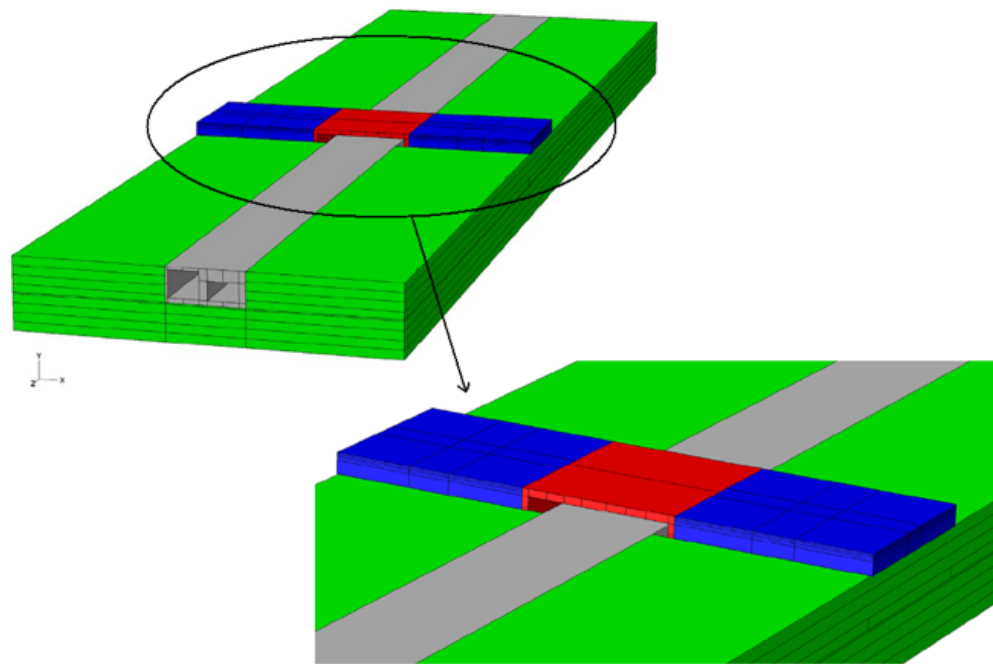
Picture showing the FEM modeling of a “hidden bridge” over the tunnel.
